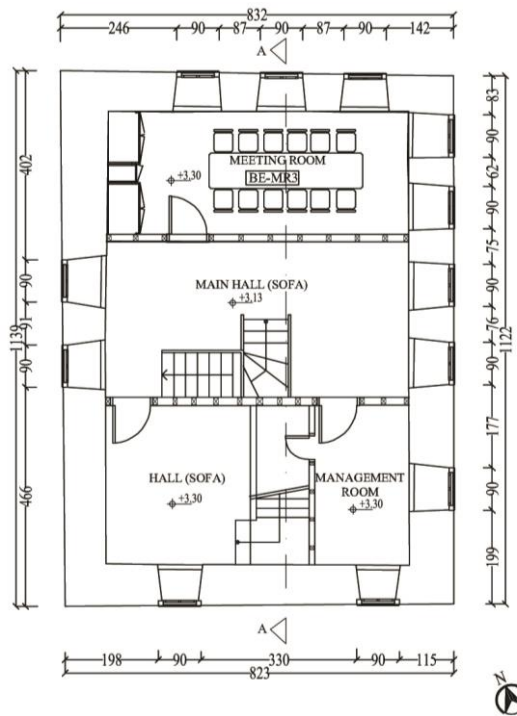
Mezzanine floor plan of Ankara Bağ Evi in 1/100 scale (Redrawn by author).
